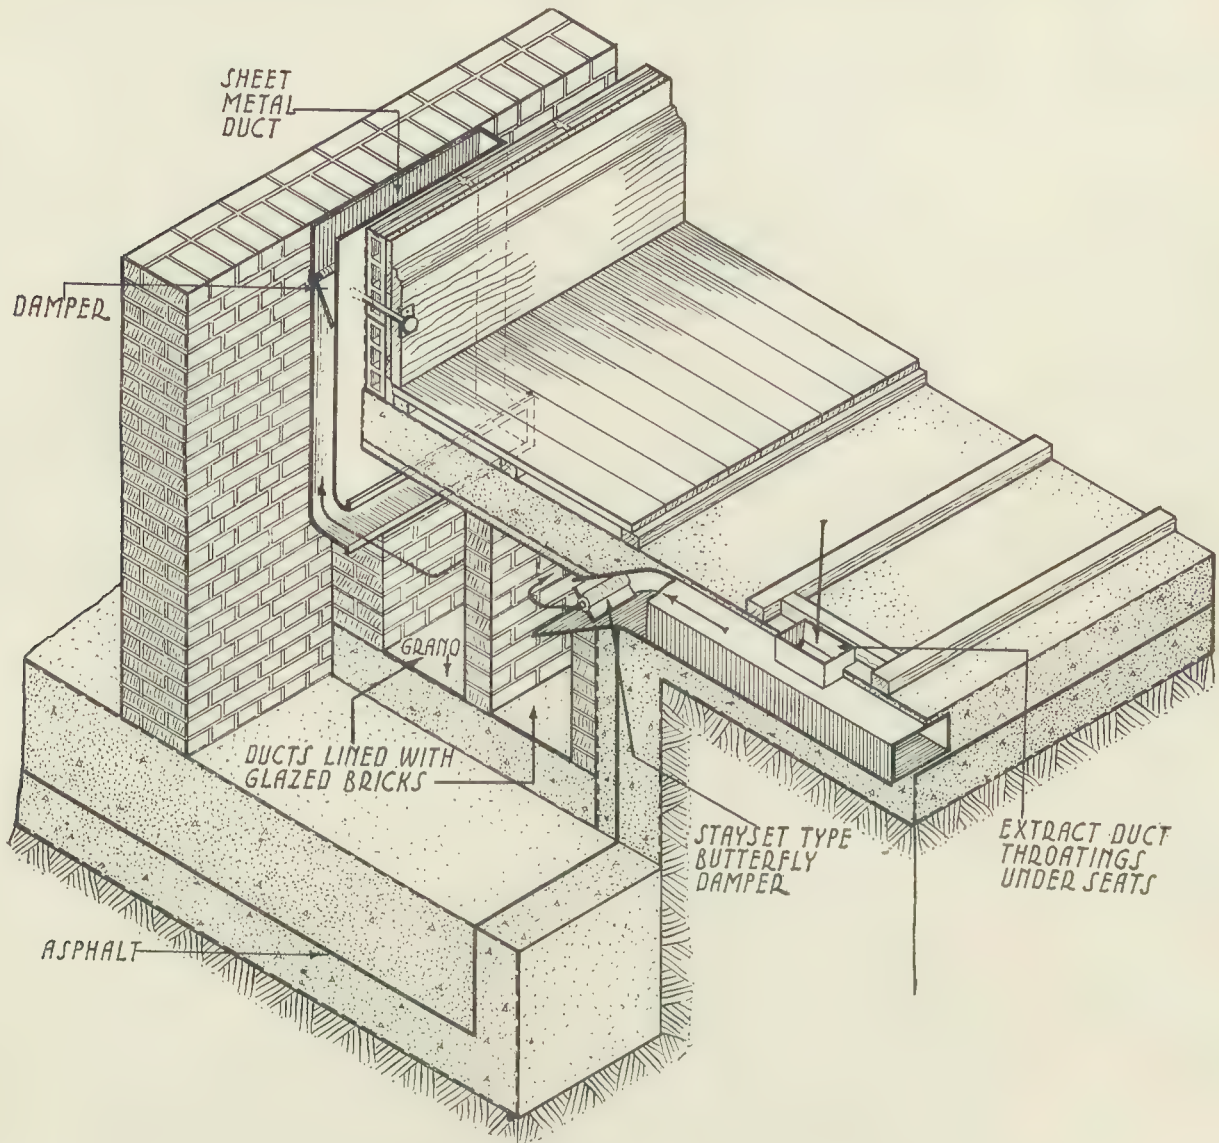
CONSTRUCTION OF VENTILATION DUCTS IN FLOORS AND WALLS
